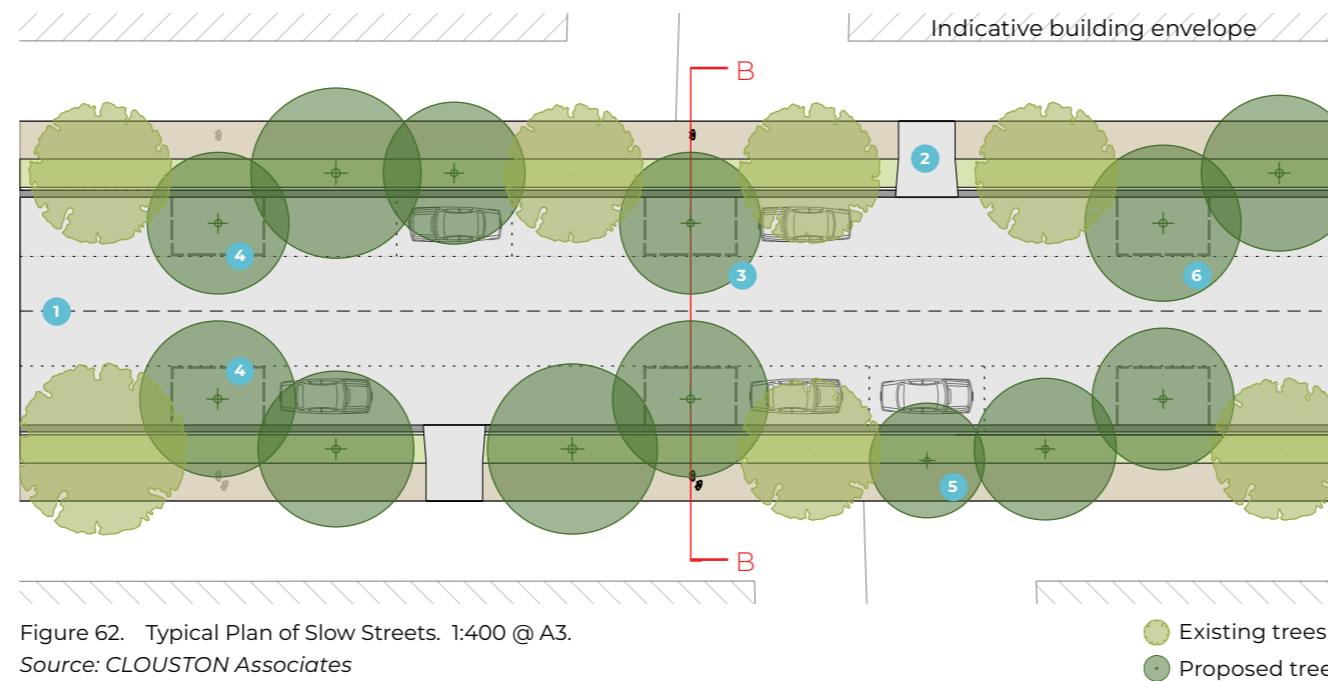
Typical Plan of Slow Streets. 1:400 @ A3.
